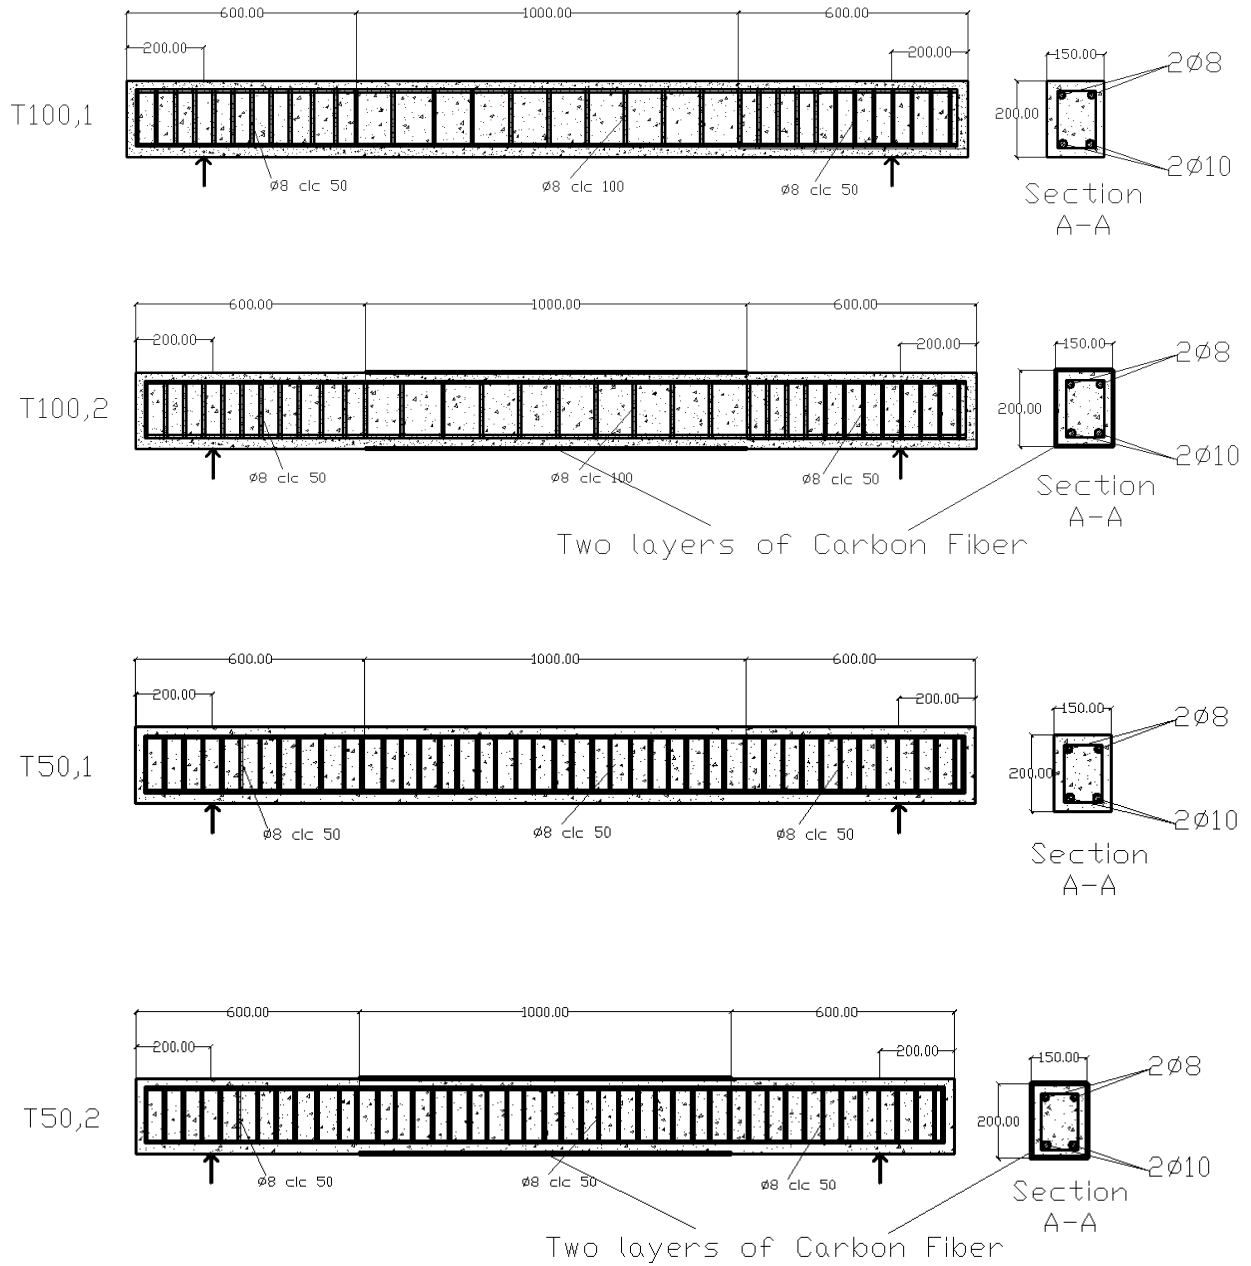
Longitudinal and transverse reinforcement detailing for specimens
